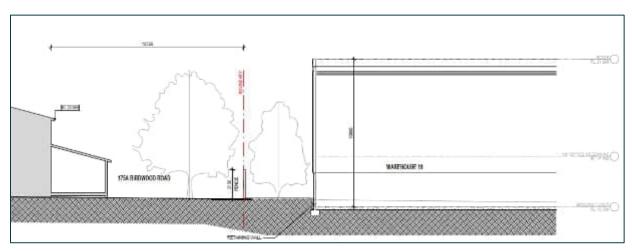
Interface between eastern warehouse and 175A Birdwood Road (north-south section)
